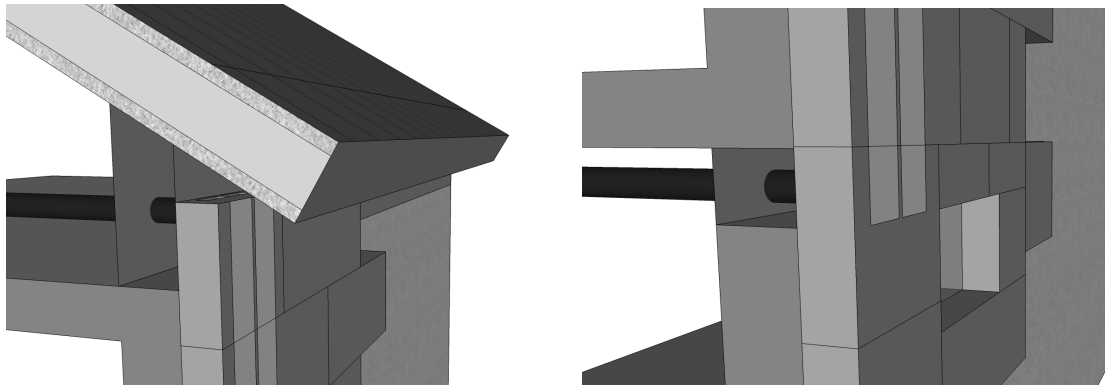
Connection between the inner distribution channels and the air ducting integrated in the thermal insulation in the attic through the jamb wall (left) and in the basement through the cellar wall (right)
